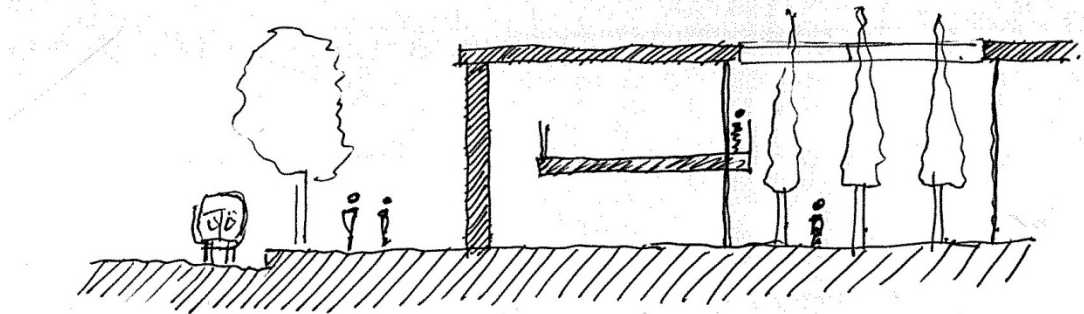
Impenetrable exterior wall and break away wall to interior courtyard. Image by author.
